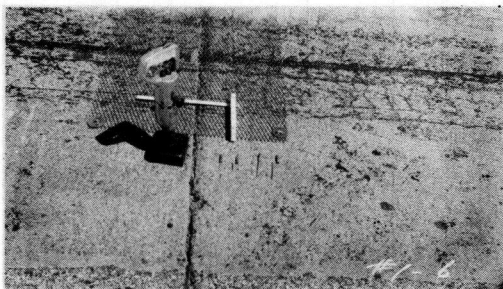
Stud driver used in fastening sheets to P.C.C. pavement.
